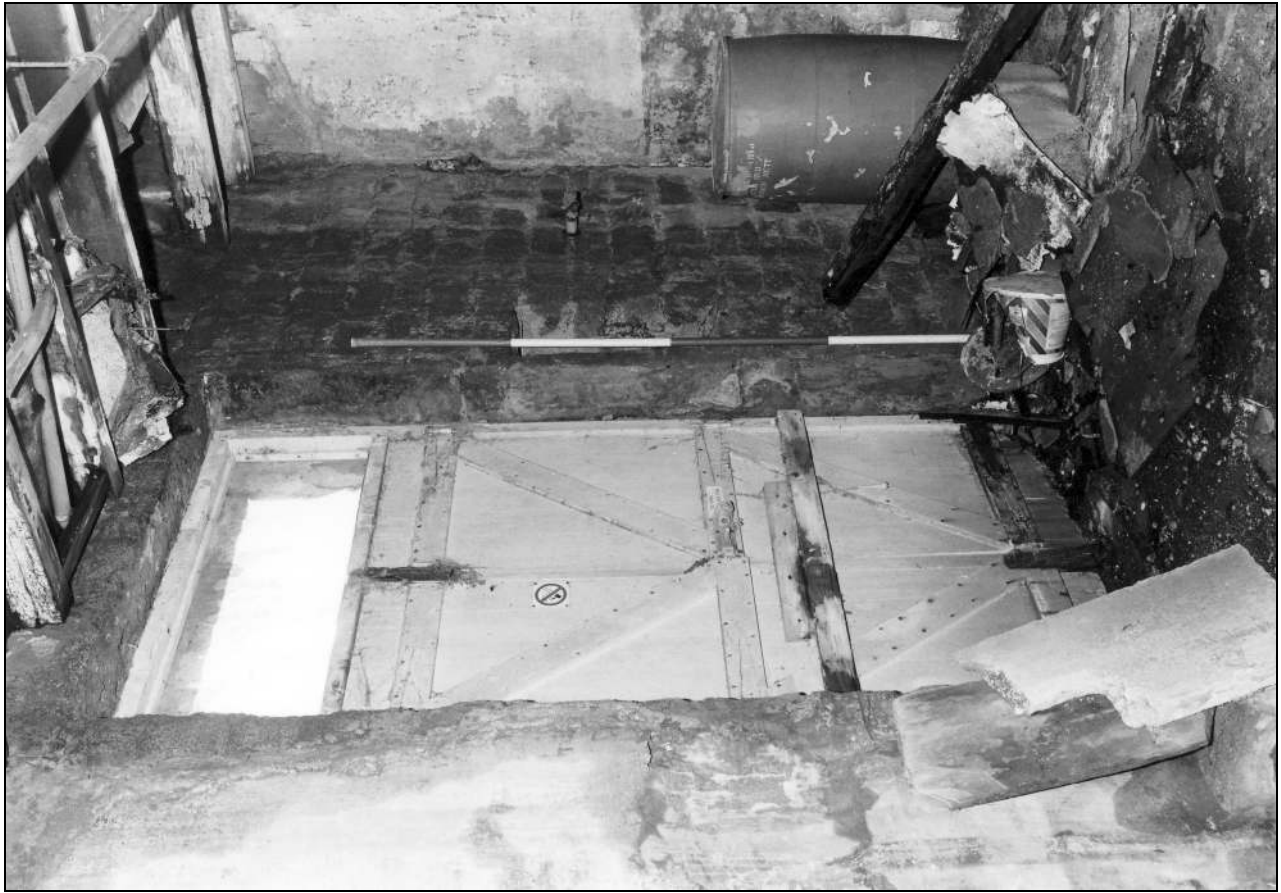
First floor of spinning mill: detail of secondary taking-in doorway, south-east corner (film 3, frame 18)
